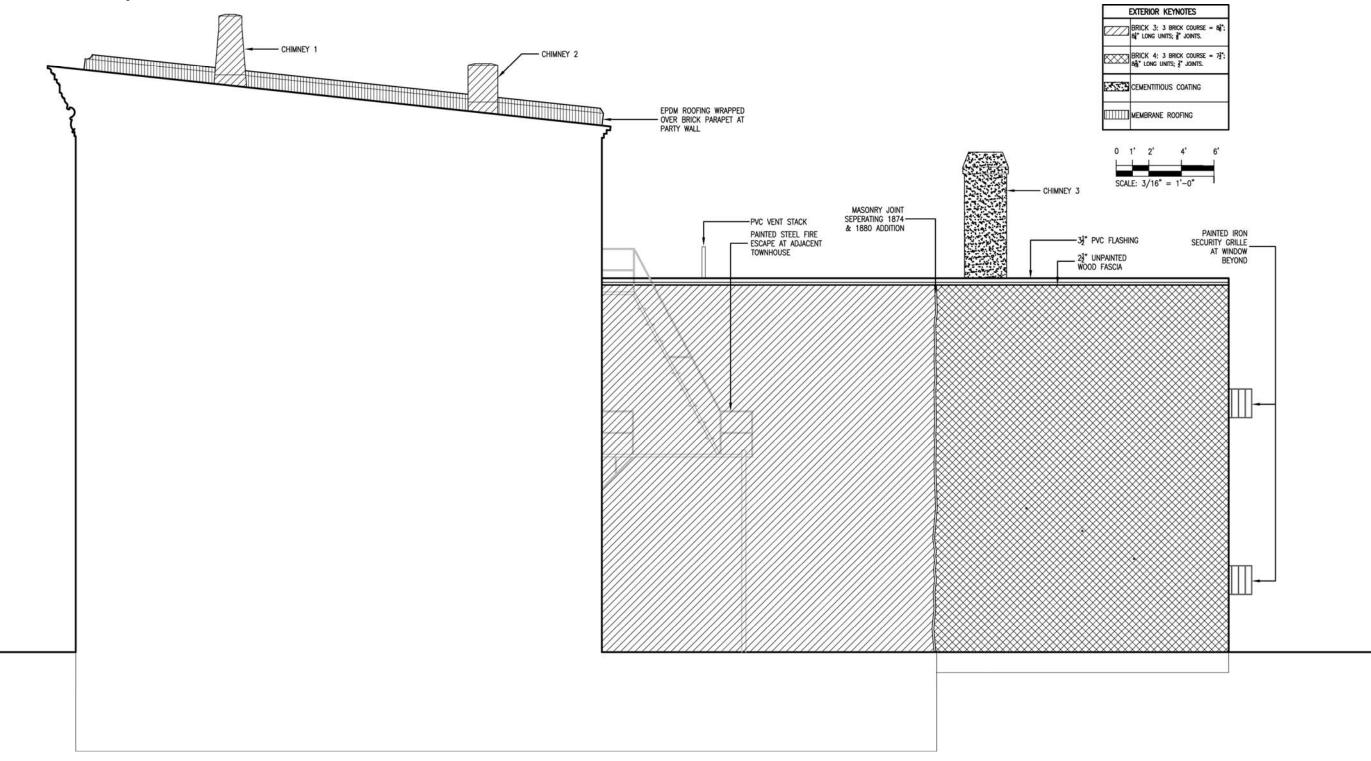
North Elevation. (Photo: BBB, 2007)
